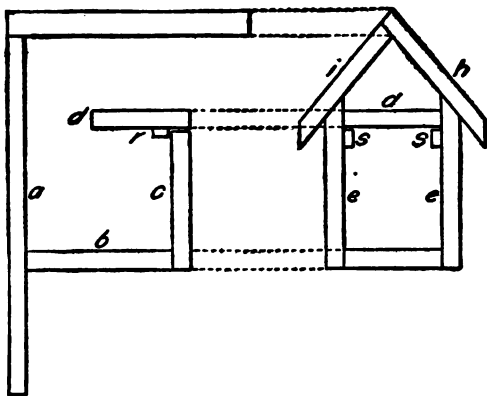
Sections of house shown in figure 29. Upper floor removable.
